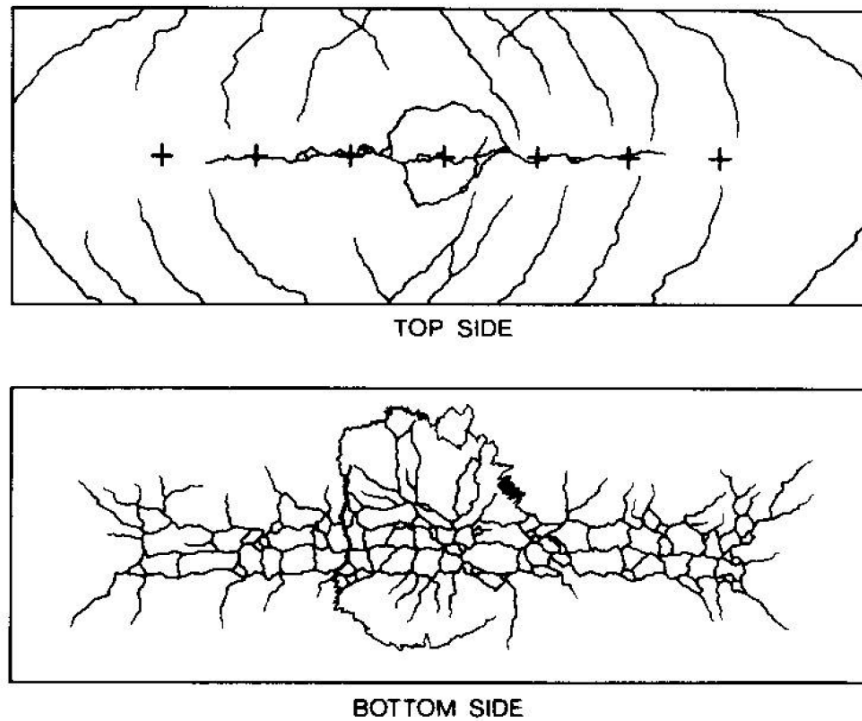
Typical cracking pattern of bridge deck slab under moving wheel load (Sonoda and Horikawa 1982)
